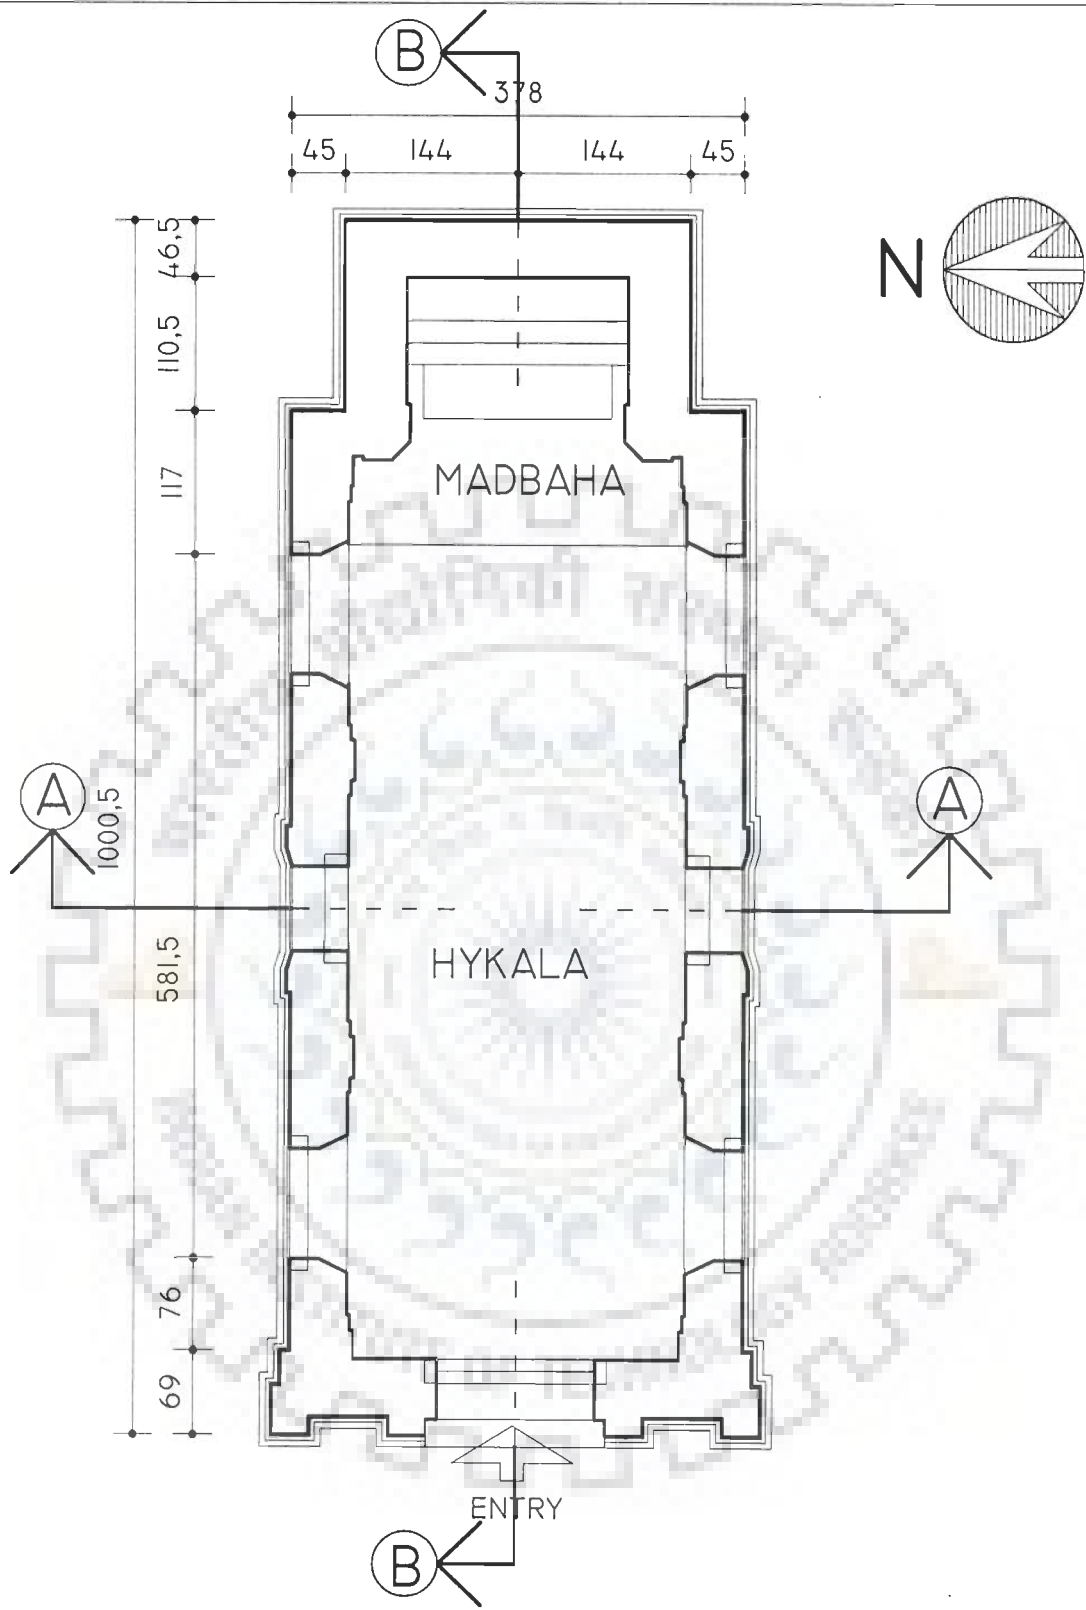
PLAN, PALLIPPURAM KURISHU PALLI
